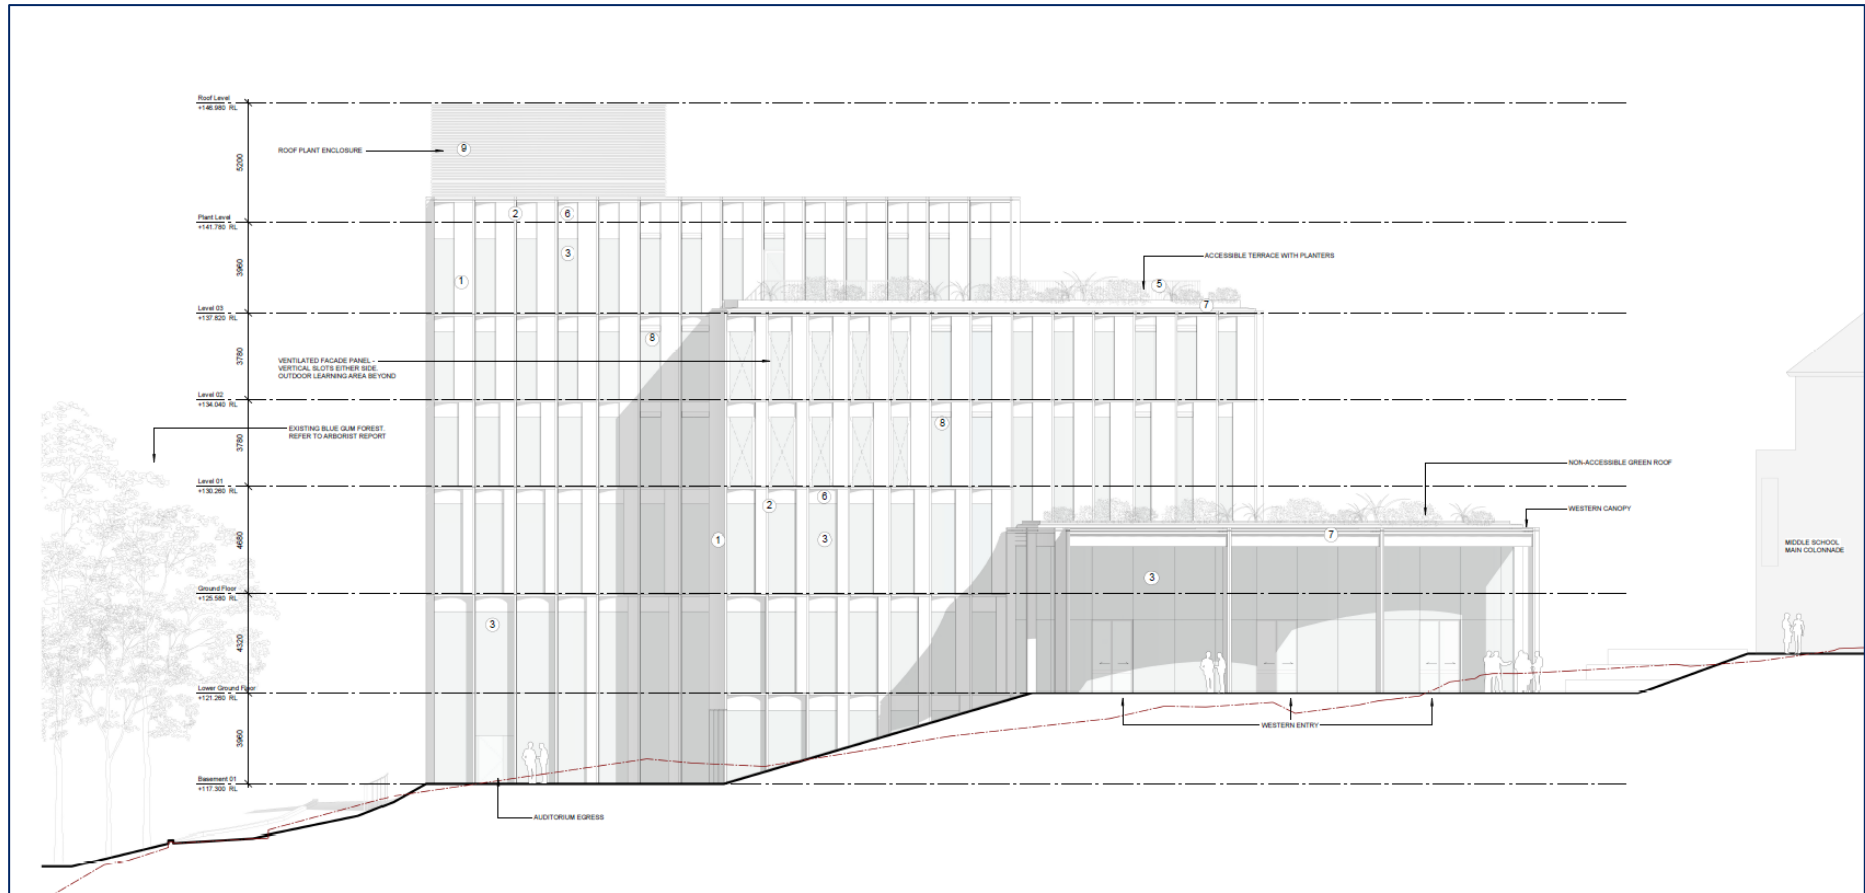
| West elevation (Source: Applicant's EIS 2025)
